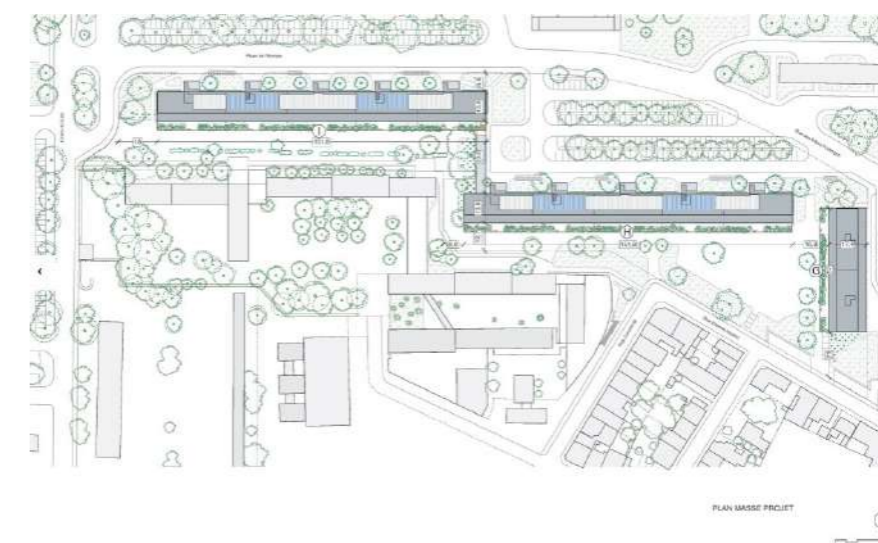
Site Plan of the G, H, and I. © Philippe Ruault.
